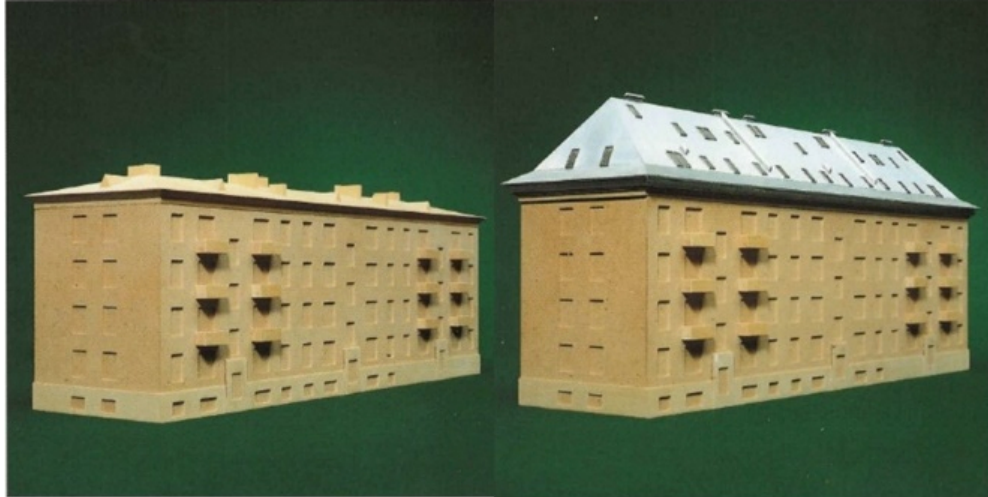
Model of the existing building and the building after renovation, Source [7]
